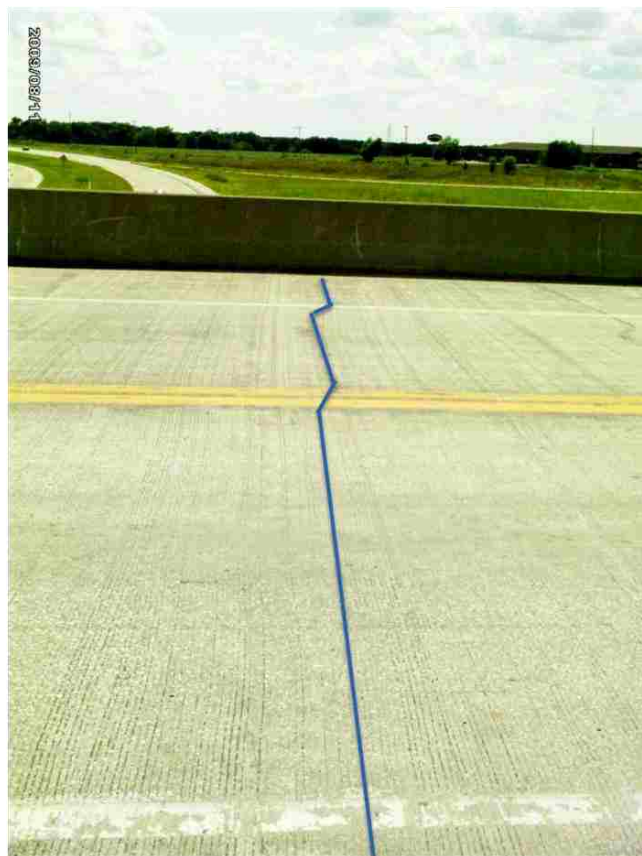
Reflective cracking observed on the top surface of bridge deck (highlighted for clarity)
